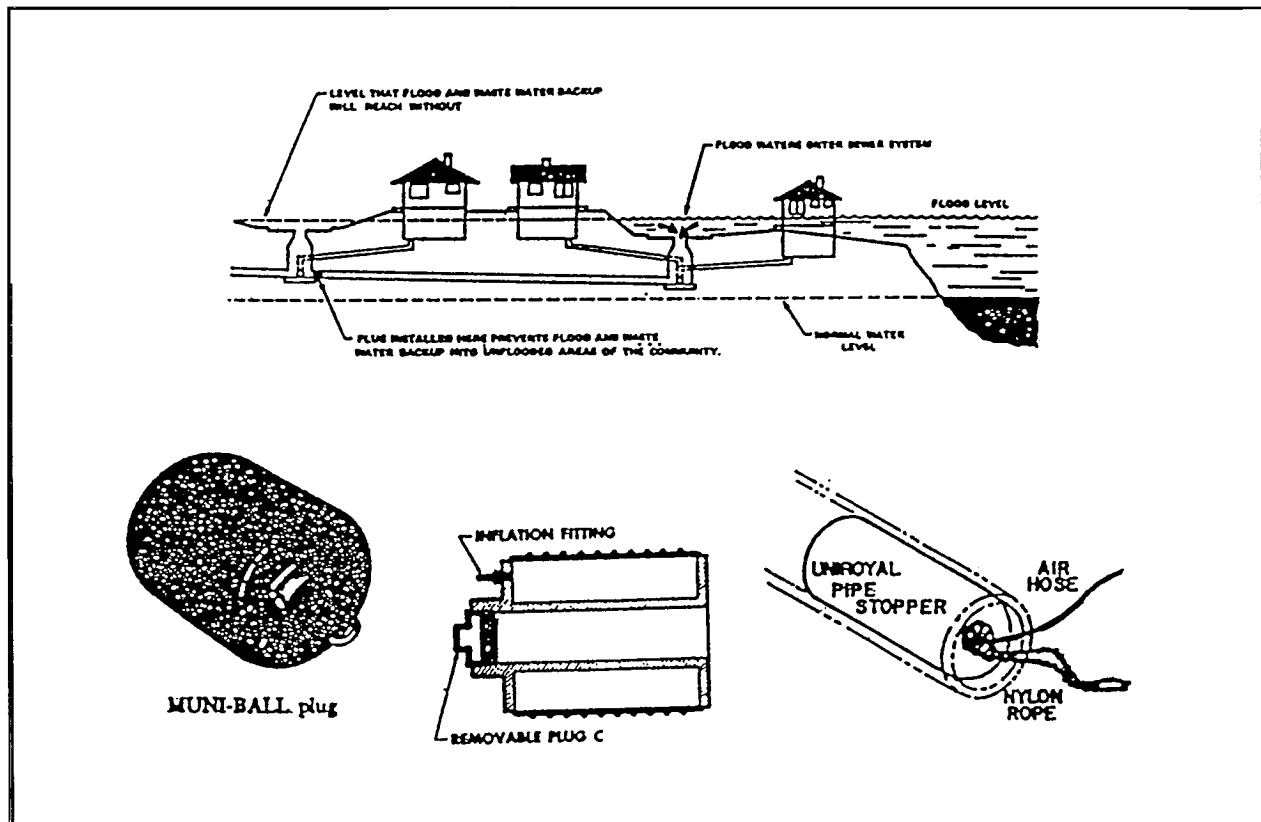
Prefabricated rubber pipe stoppers for outlet opening of a manhole
